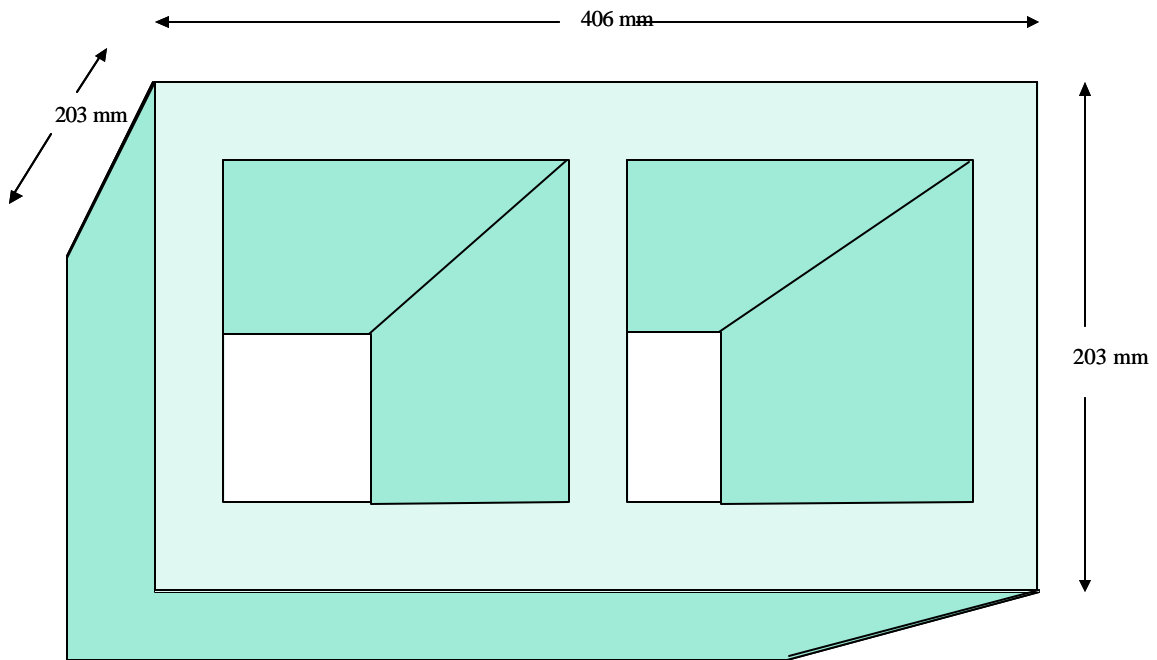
Typical Block from East Abutment Structure (133 to 182 N or 30 to 41 lb. in weight)
